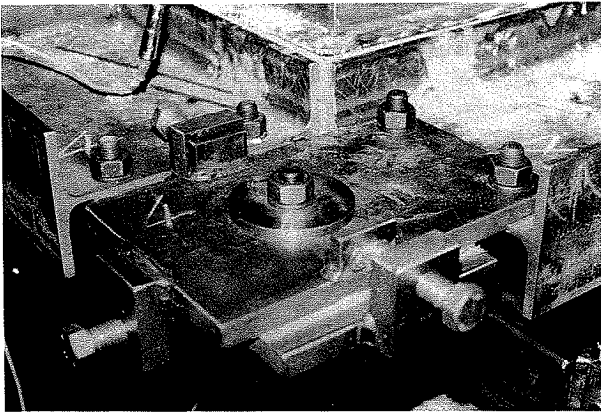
The special corner devices designed for installing and adjusting the steel surroundings.
